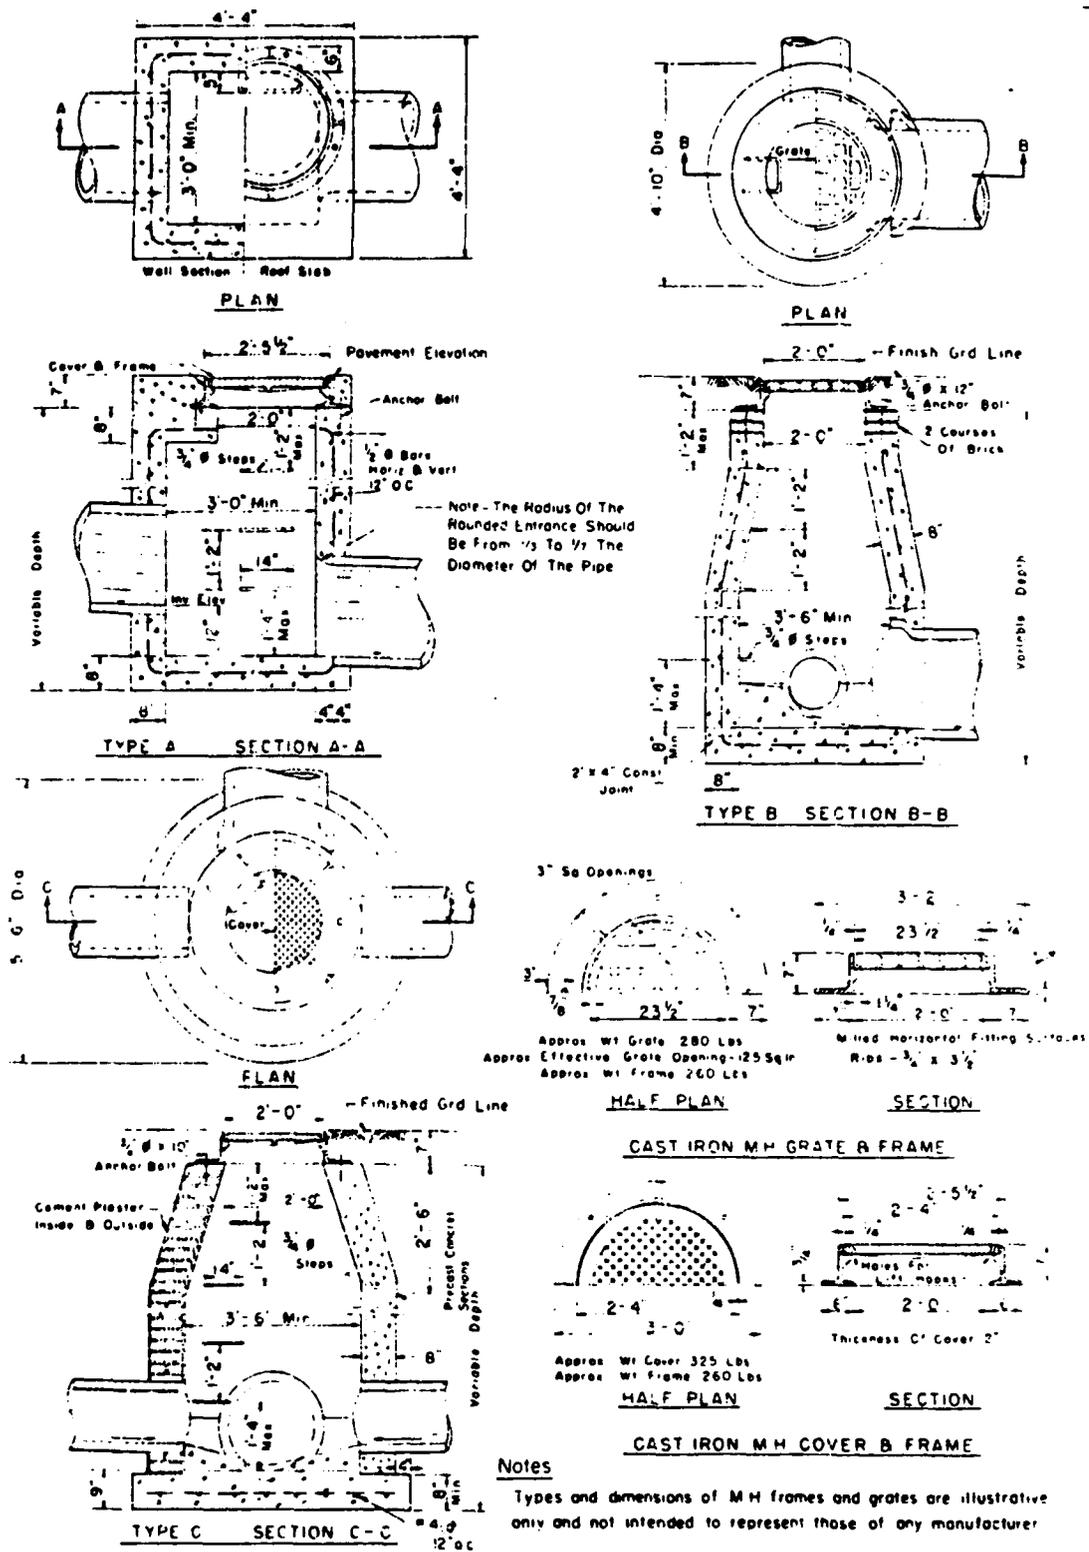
Typical Design Details for Manholes (Ref. 1).
